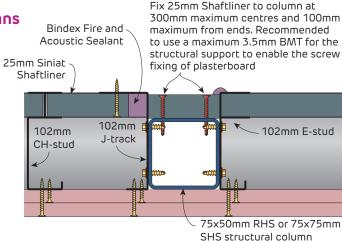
Shaft Wall Bulkhead using SHS Column with 102mm CH-Studs
